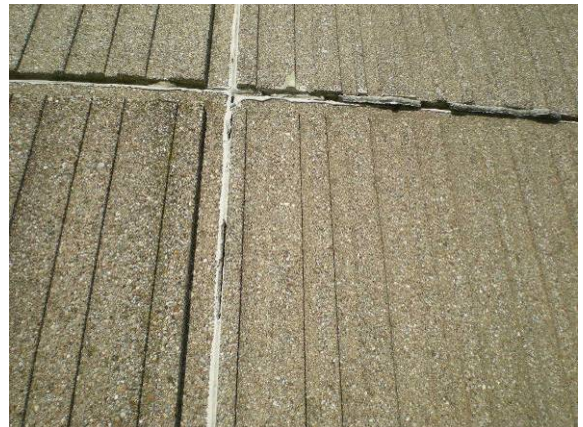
Damaged joints at gymnasium – typical throughout gymnasium
